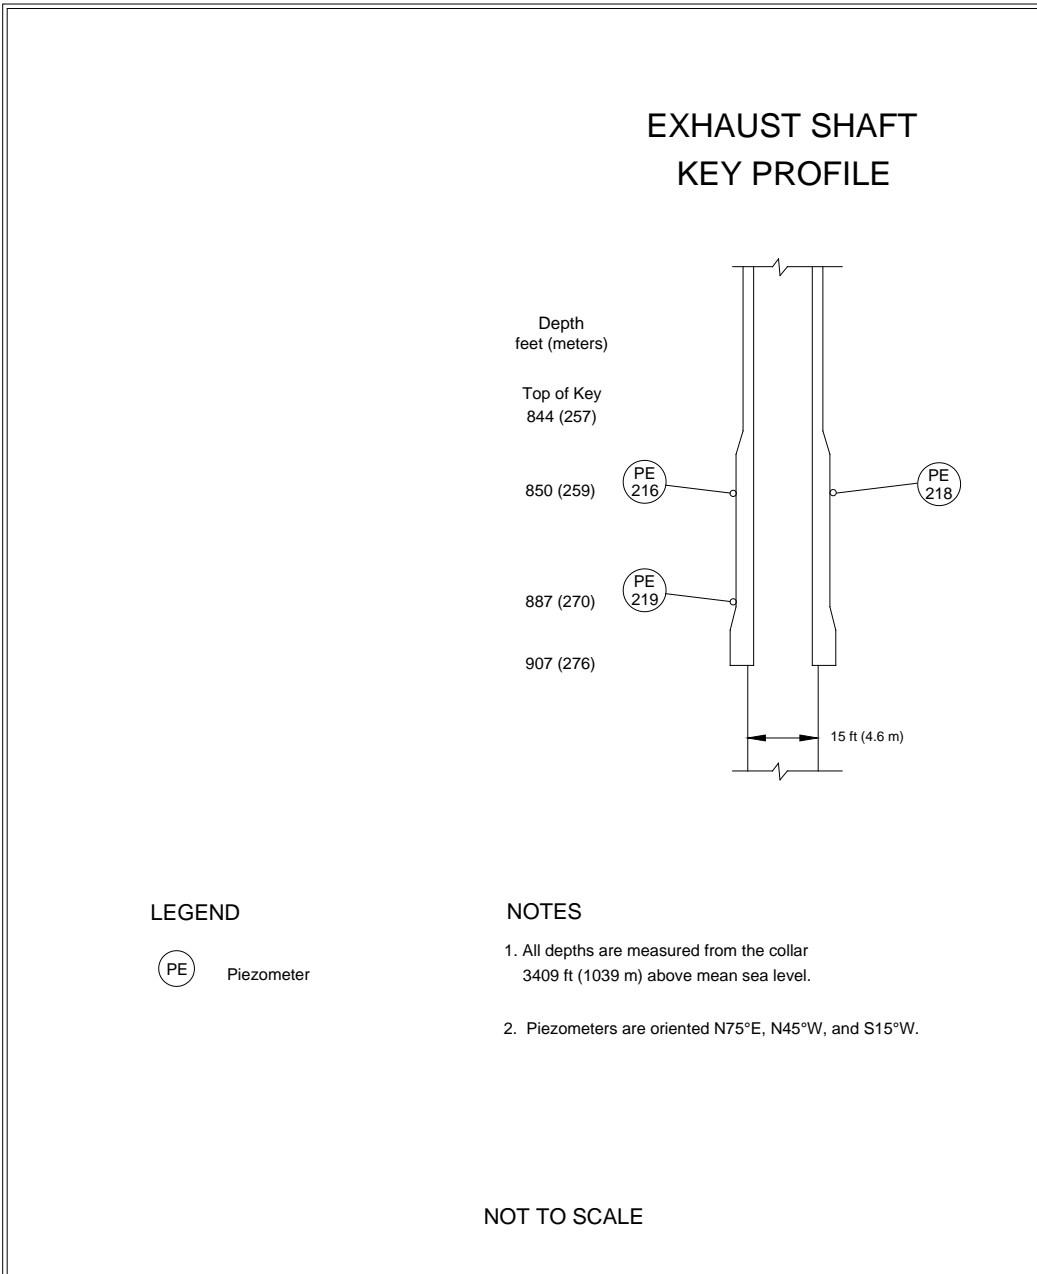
13 – Exhaust Shaft Key Instrumentation
